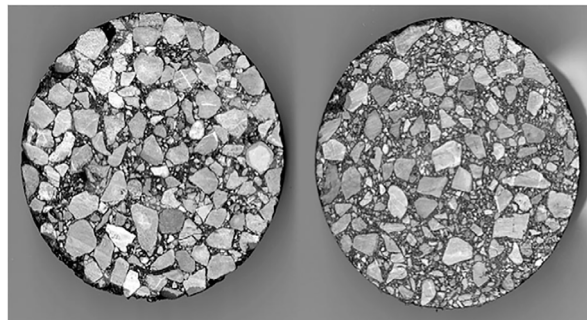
, Drilled cores - Stone Mastic Asphalt (left) and Asphalt Concrete (right)
